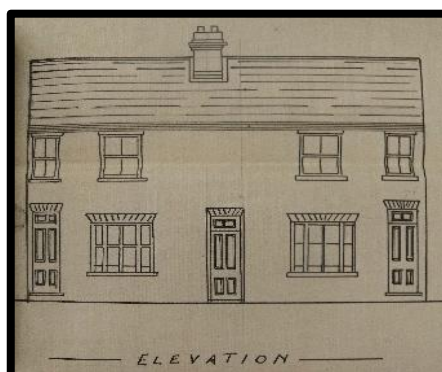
Nos 17 & 19 Madras Road, proposed front elevation (CA CB/2/SE/3/9/2122)
